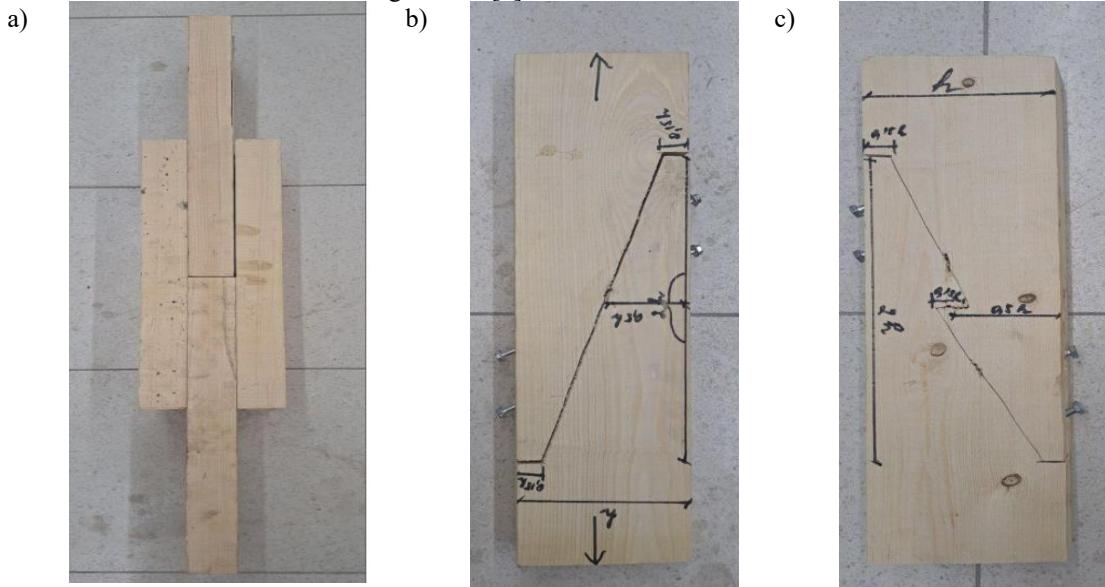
Connections of wooden structural elements: a) current connection of type T-1,
